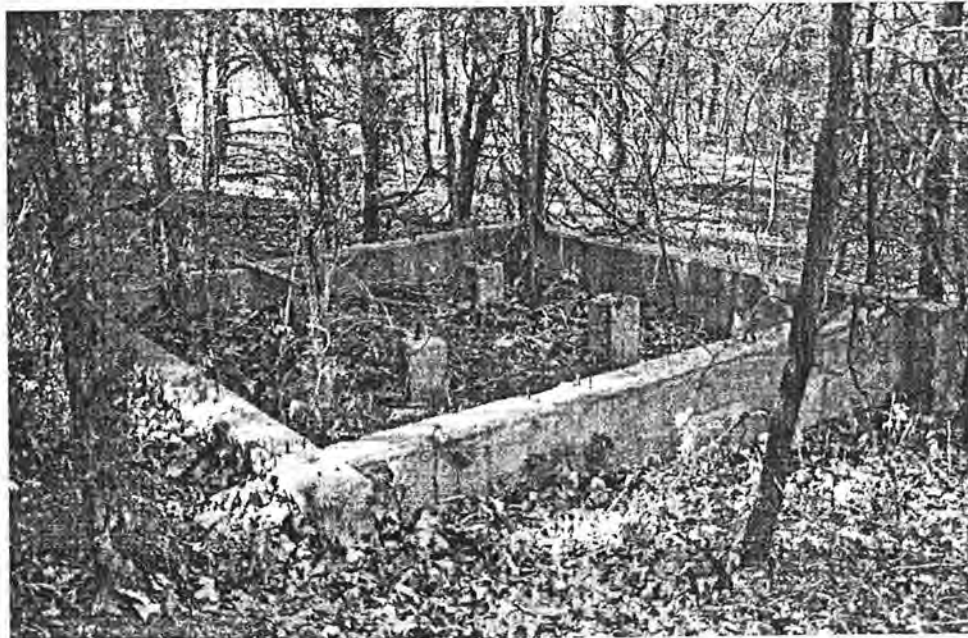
33 Pk 189 (PIK-205-12). Mount Gilead Cemetery; plant-related observations platform base, facing south.
